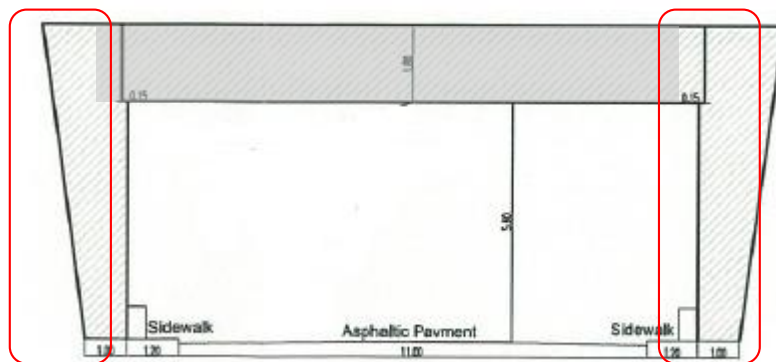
Disposition of abutment walls of bridge (section 4-4)
